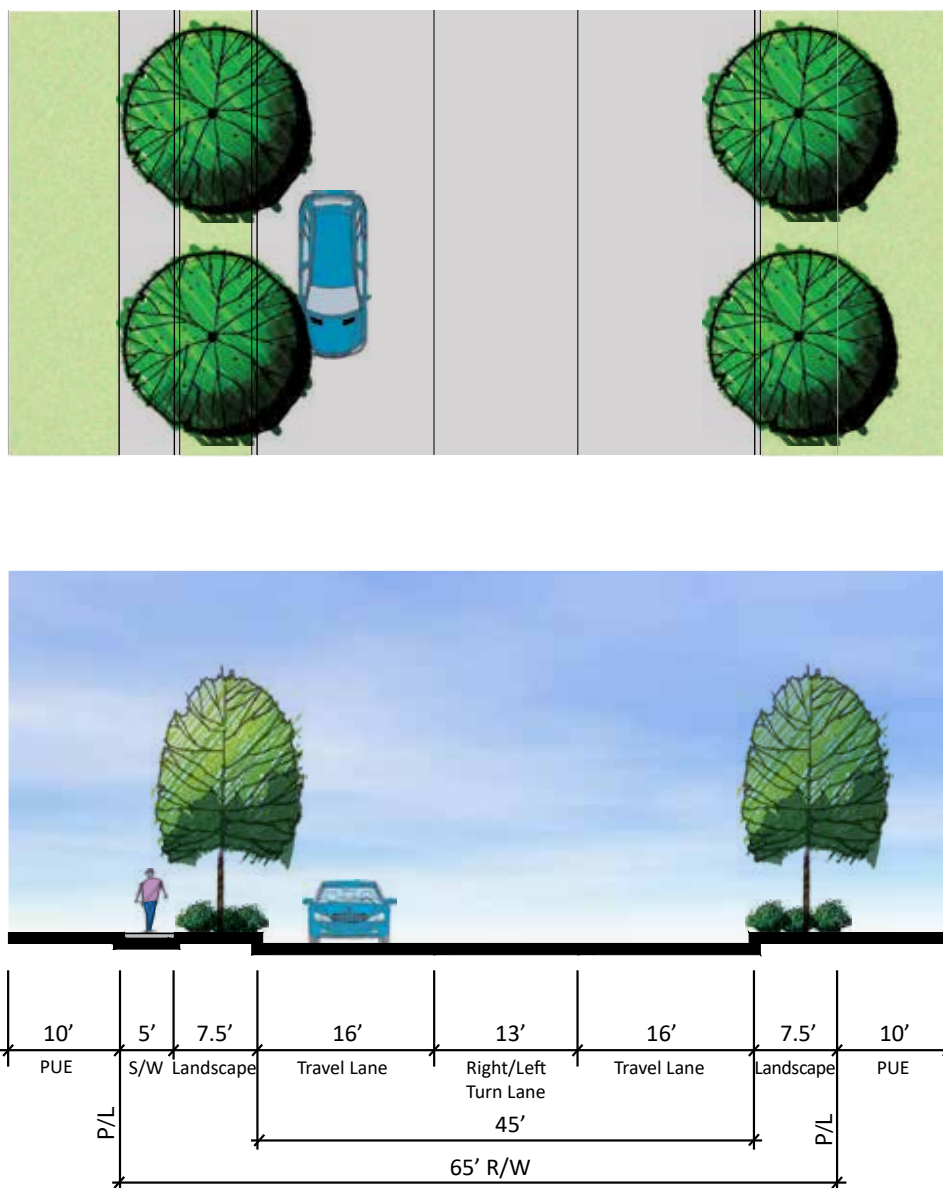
, 2-Lane Local Industrial Street, Section H-H
